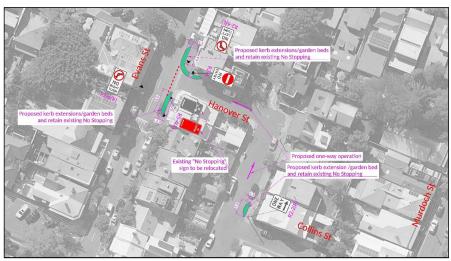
Evans Street / Hanover Street / Collins Street intersections proposal.
